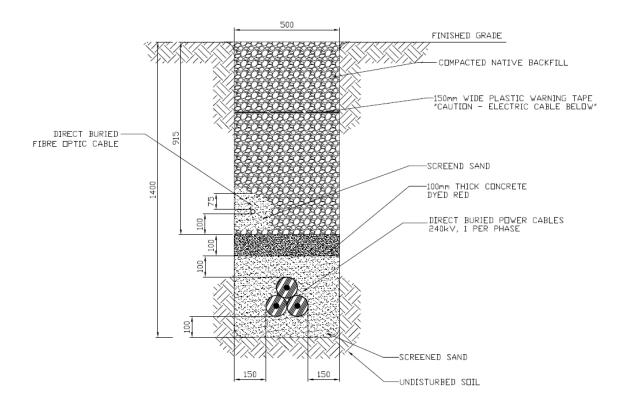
Typical Trench Detail for 230 kV Buried Cables
